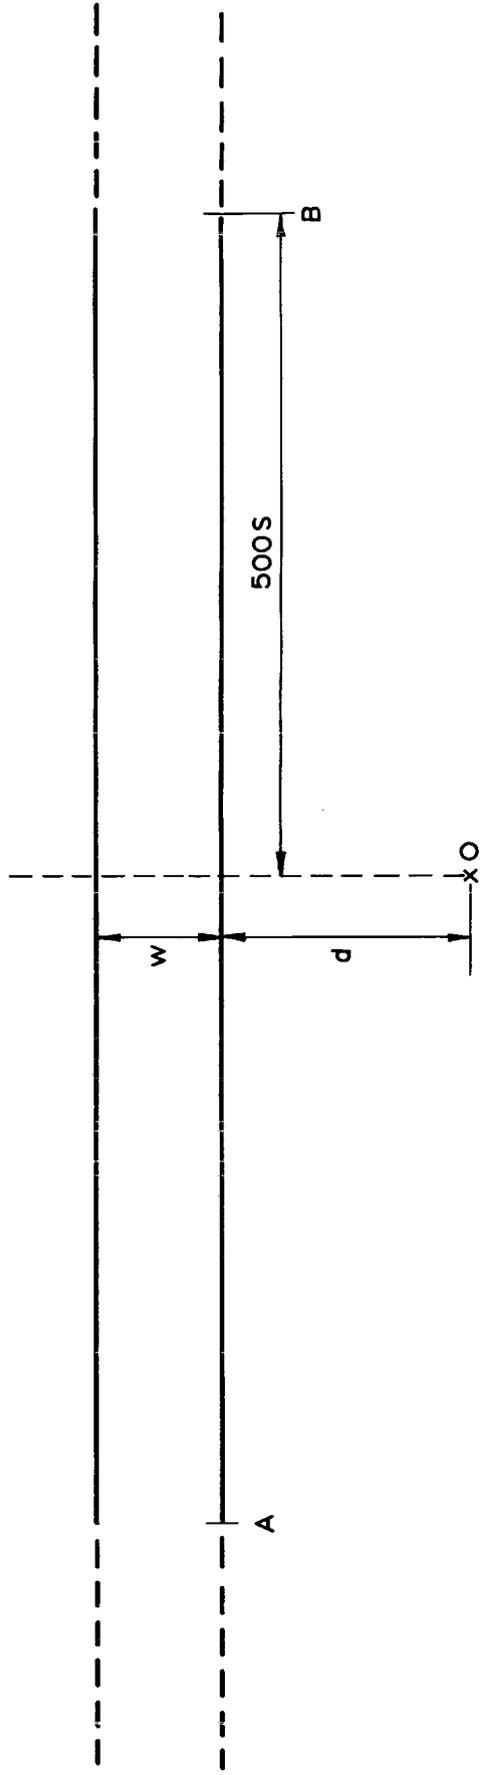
PLAN OF THE HYPOTHETICAL SINGLE LANE ROADWAY ELEMENT
